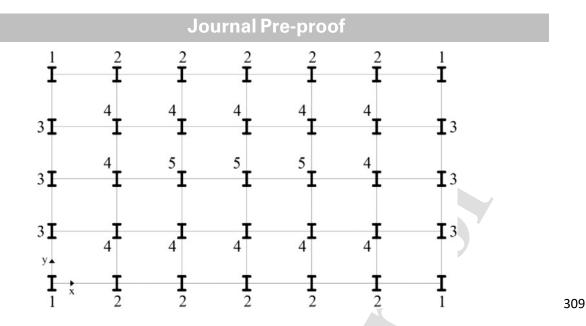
Columns grouping of 1026-member 10-story steel frame in plan level, [41]. 310
